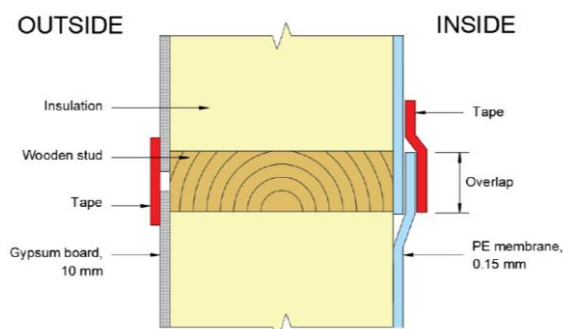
Cross section of an exterior wall showing a simple tape connection of boards.
